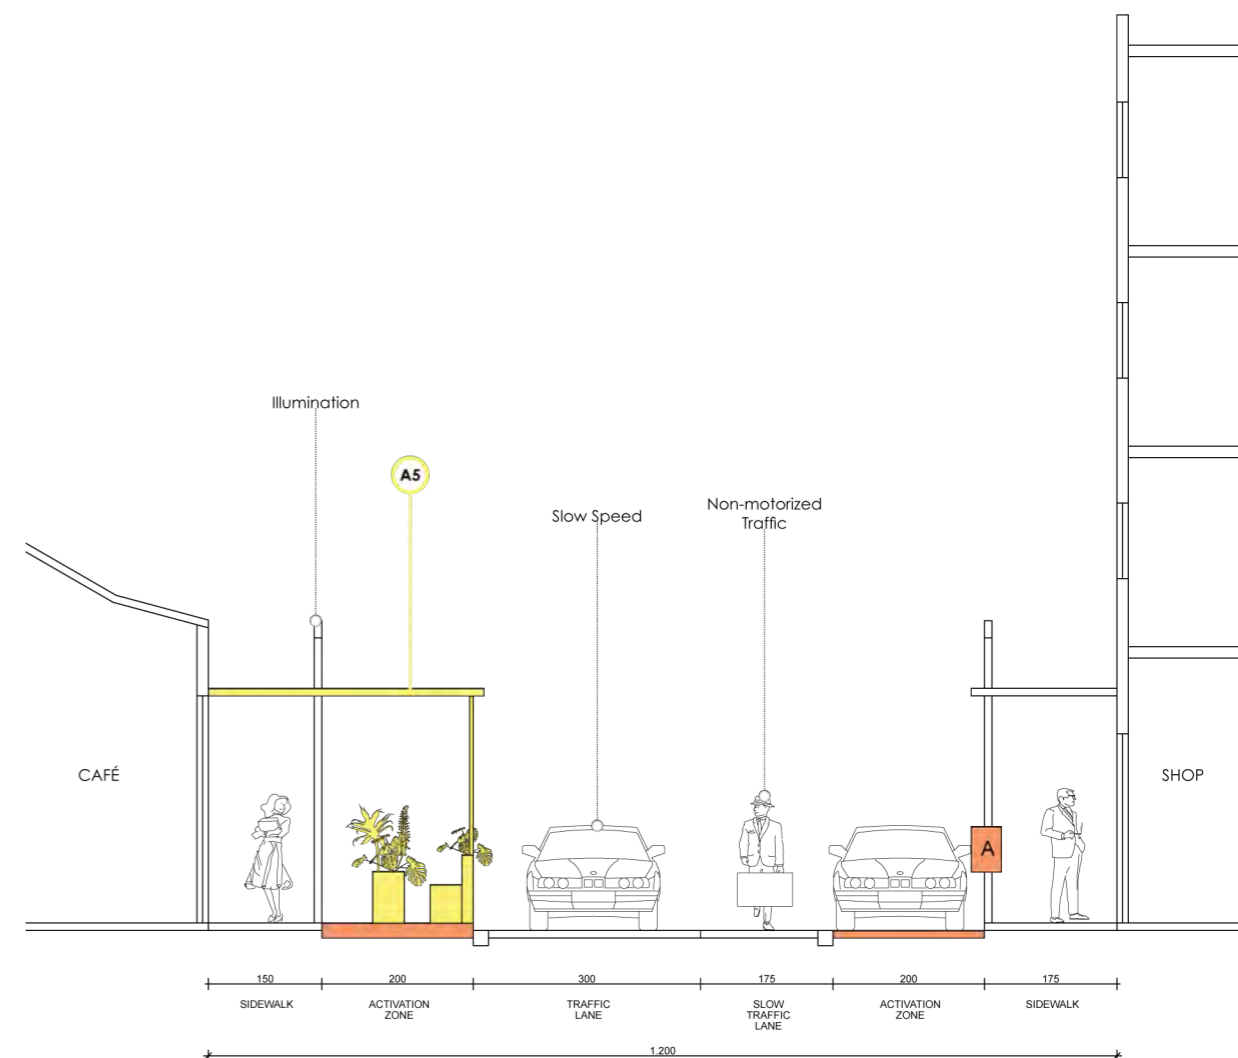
(next page): Street section of a prototypical Market Street. Example: C/ Restauración.
